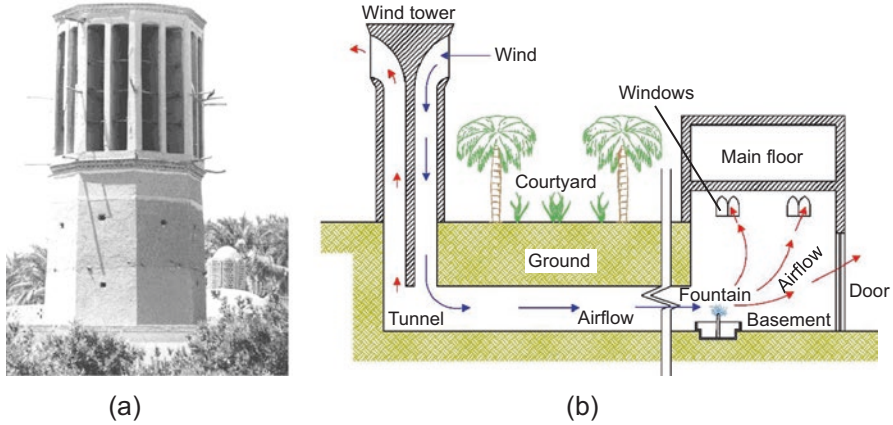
(a) Photo and (b) schematic cross-section of an old wind tower, built outside of the building, located in Bam City, Kerman Province, Iran [50, 64]
